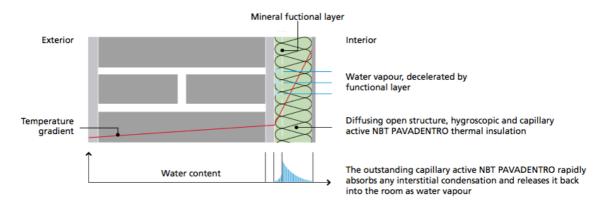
Manufacturers detail showing vapour route through the externally insulated solid masonry structure.
